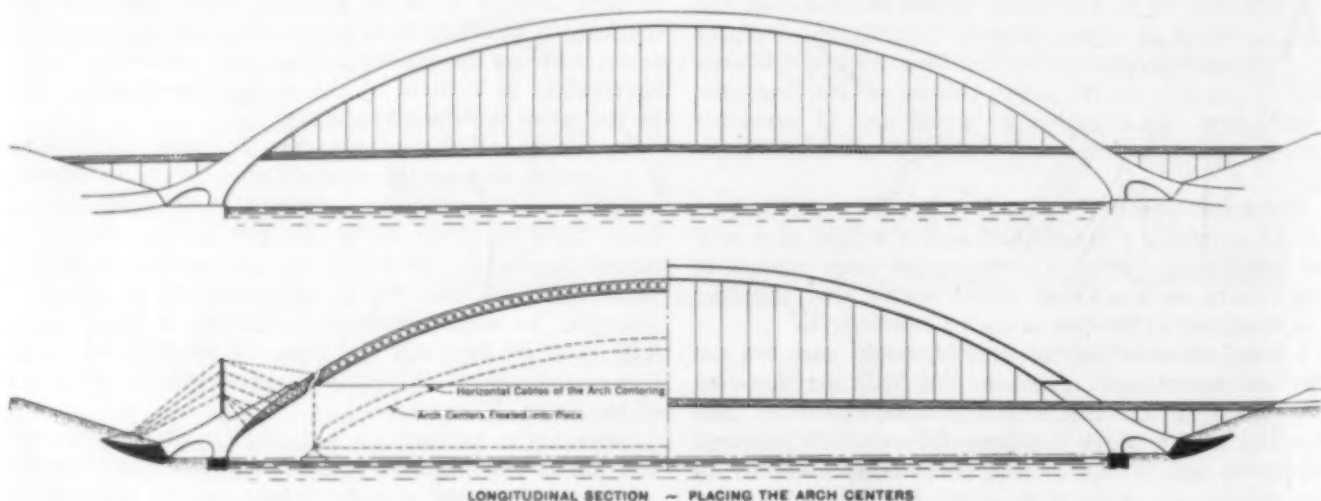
ELEVATION OF A 3,280-FT. CONCRETE ARCH SPAN
